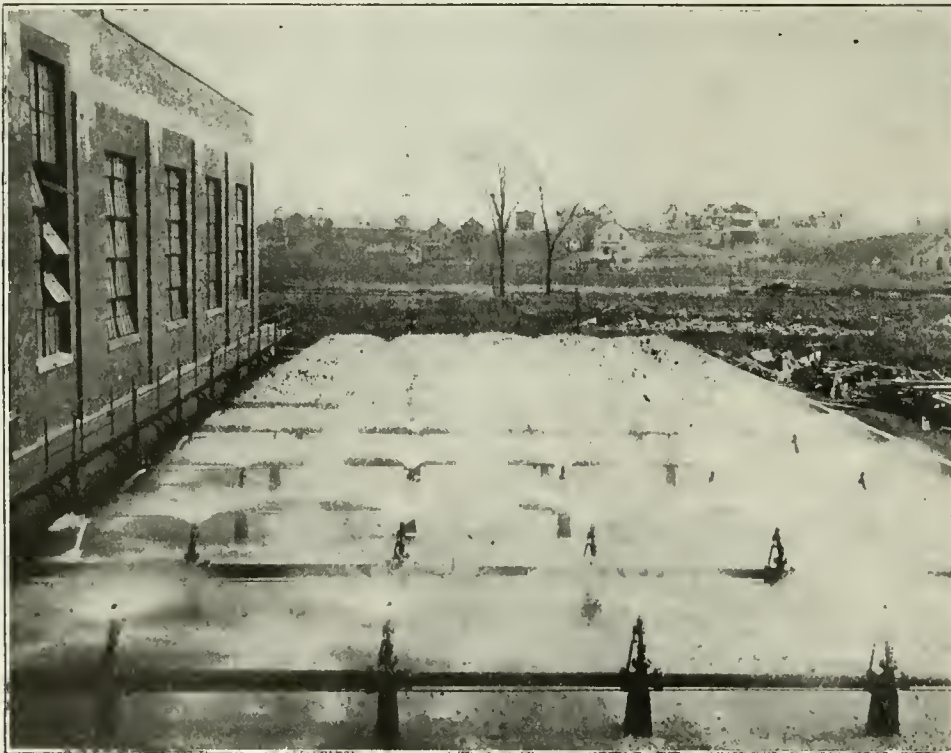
"YARWAY" SPRAY-HEAD INSTALLATION, HEAD COMPRESSED
